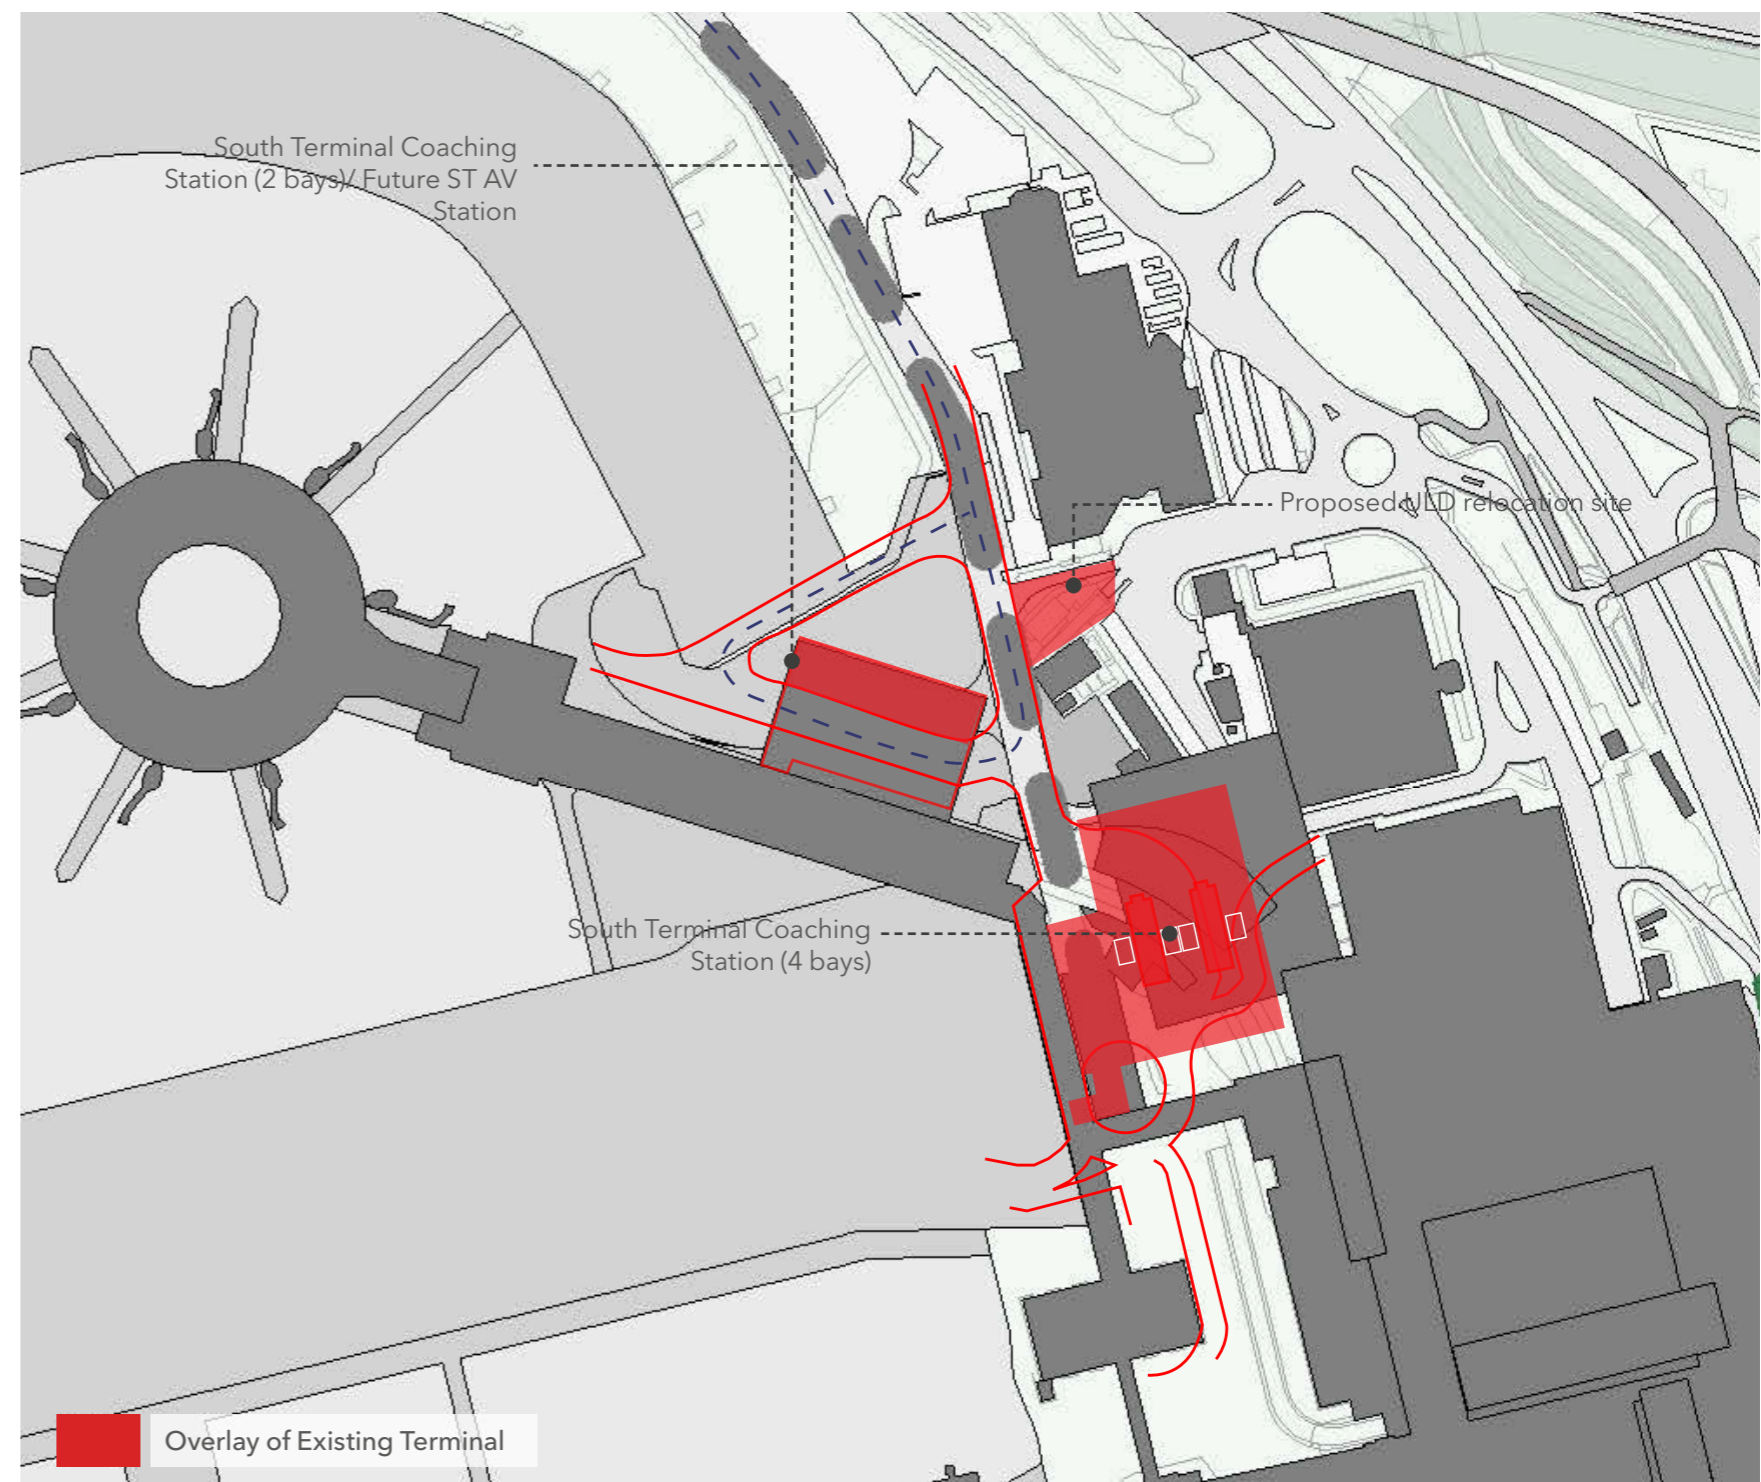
Proposed Site Plan - Additional Coaching Gates & Autonomous Vehicles Station
